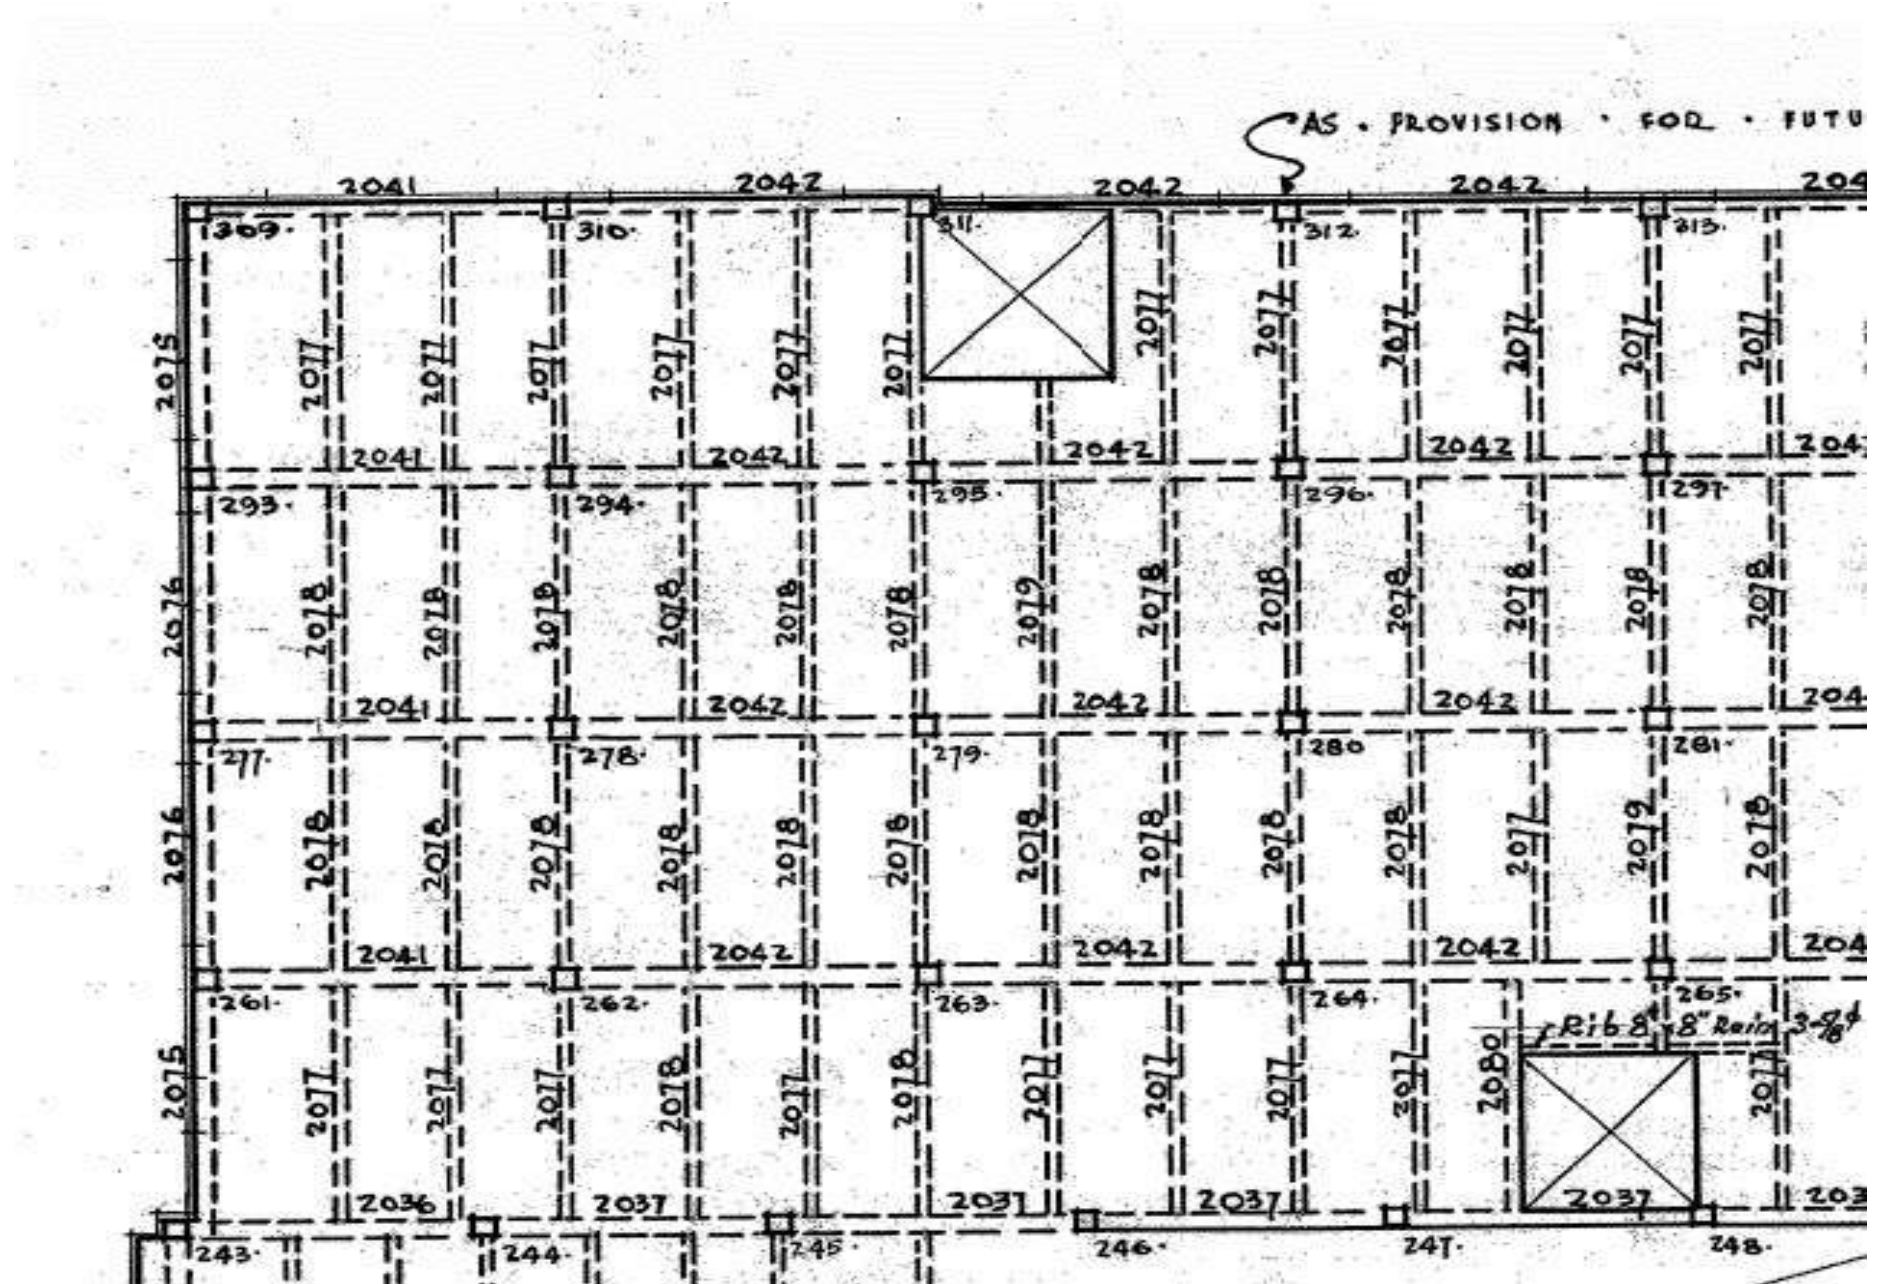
FLOOR JOIST 2078 WAS ANALYZED AS A TYPICAL FLOOR FRAMING MEMBER
